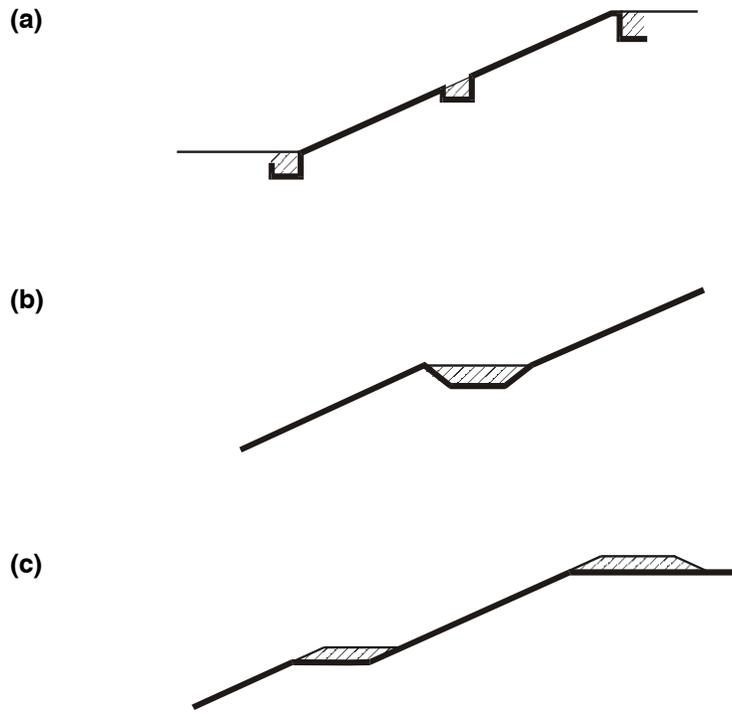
Examples of anchor trenches (a, b) and benches (c).
